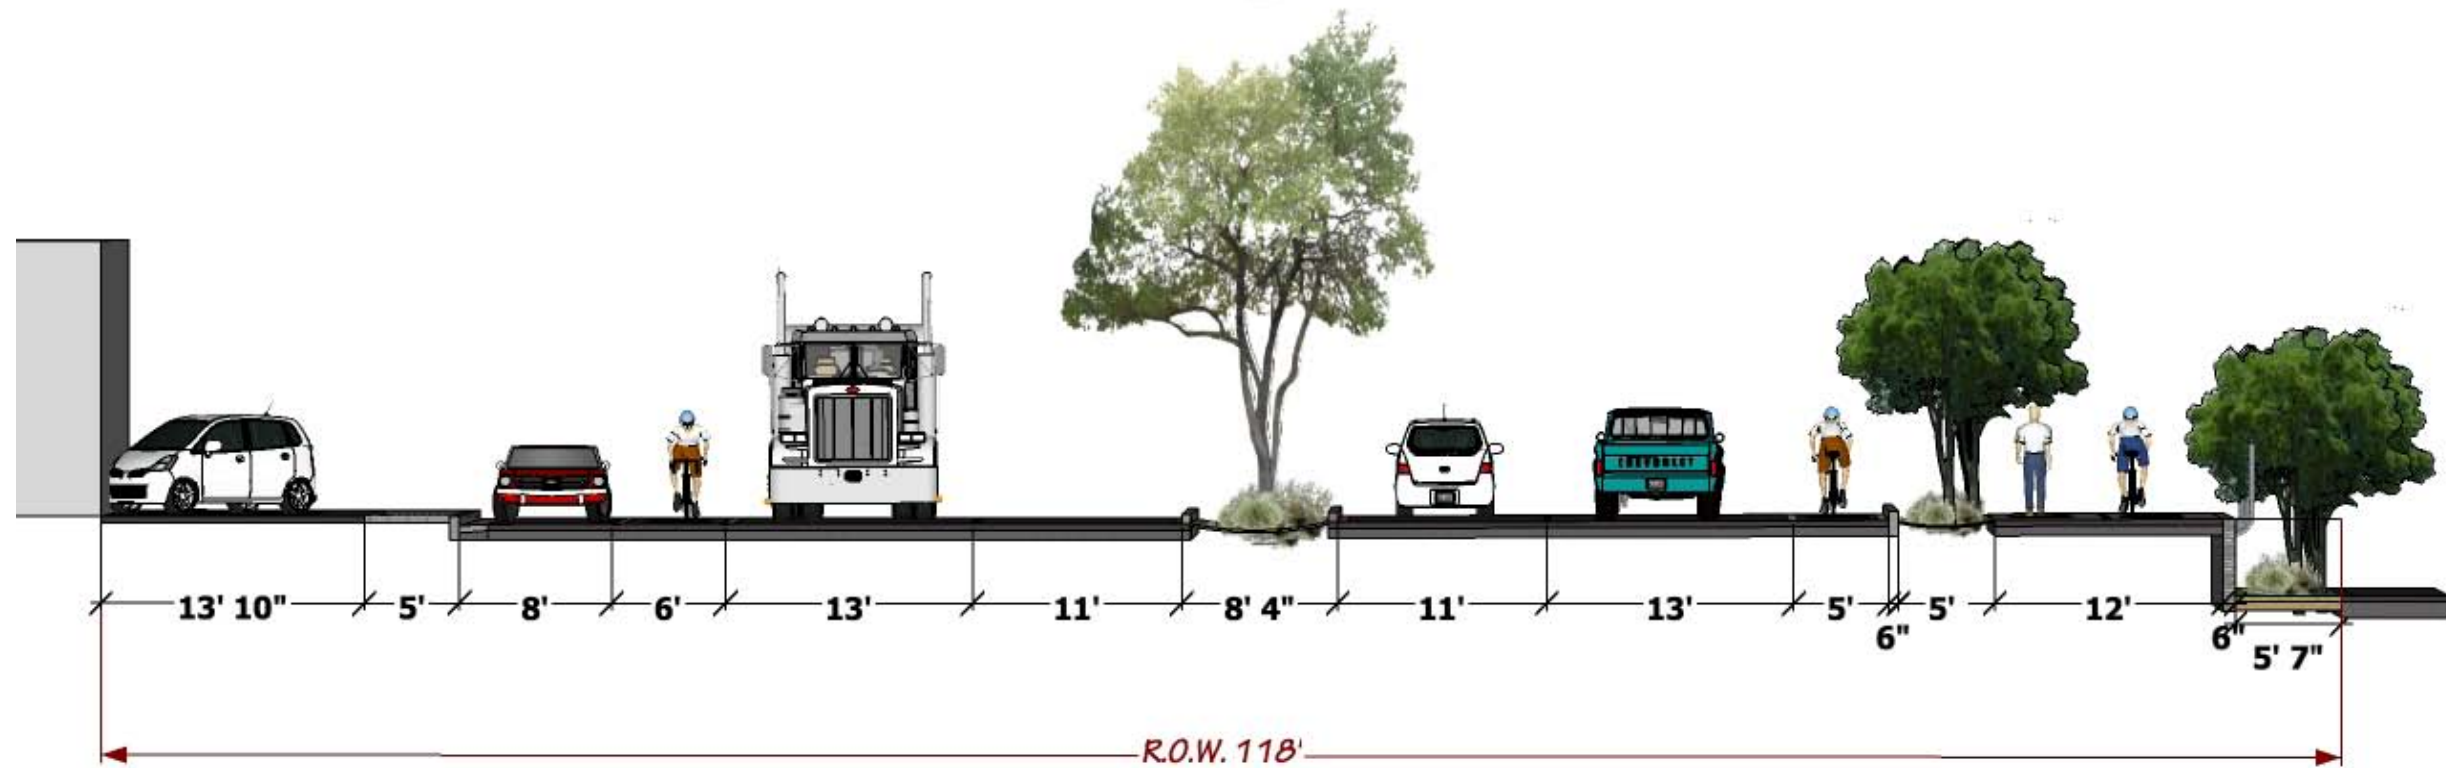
Overview of Project Improvements Looking North from Cesar Chavez Parkway
